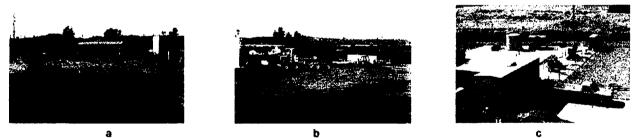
Hynol site development work (a,b) ground preparation (c), asphalt and concrete completion.
